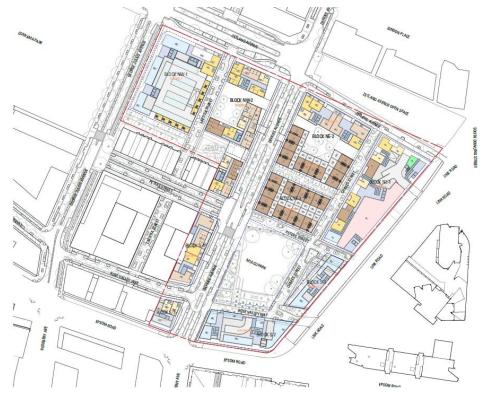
Reference scheme indicative ground floor plan (Source: CoS draft planning proposal 2023)
